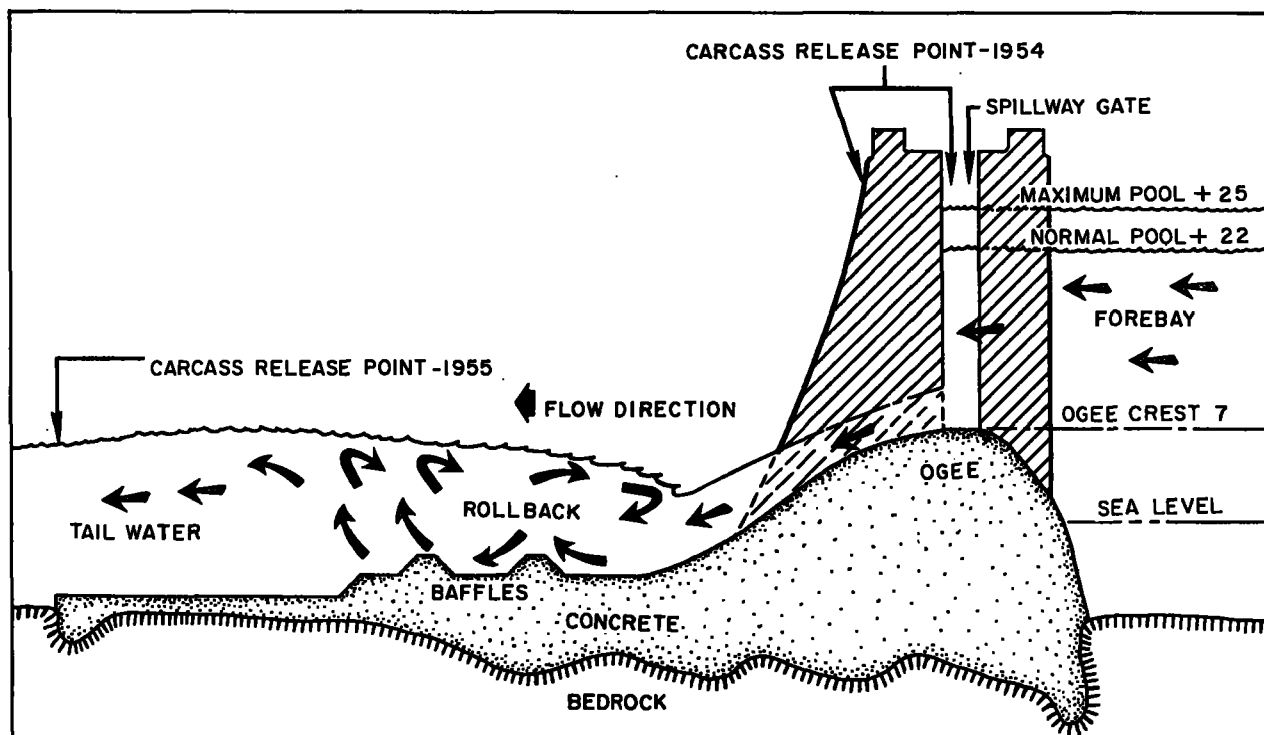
Bonneville Dam spillway construction and flow cross-sectional diagram (from U.S. Army Corps of Engineers drawing). Elevations are in meters above mean sea level.
